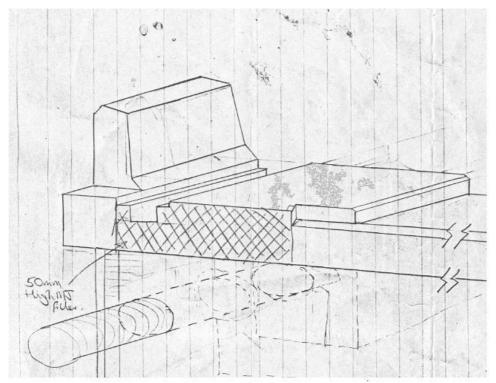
Northern Bridges and Haul Road on Banbury Bypass Contract 3
